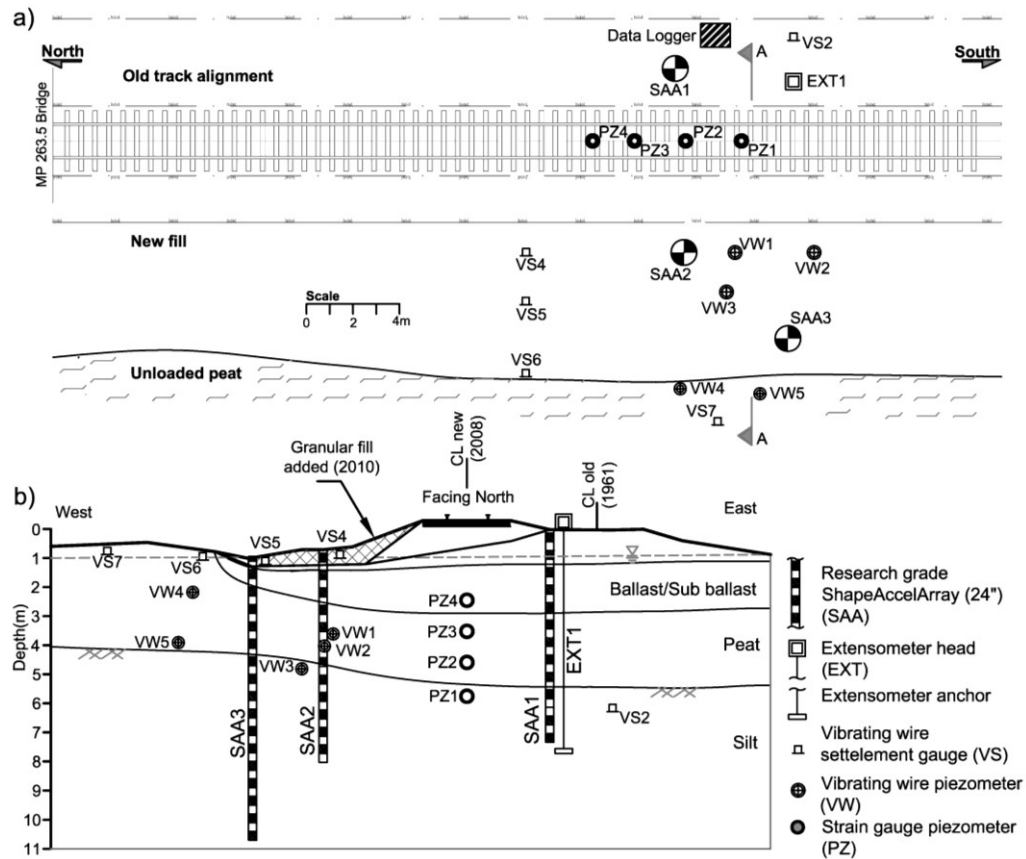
Summary of the instrumentation installed at the field site: (a) plan, and (b) cross-sectional elevation (section A-A) with summary of the stratigraphy, embankment geometry, and history of construction.
